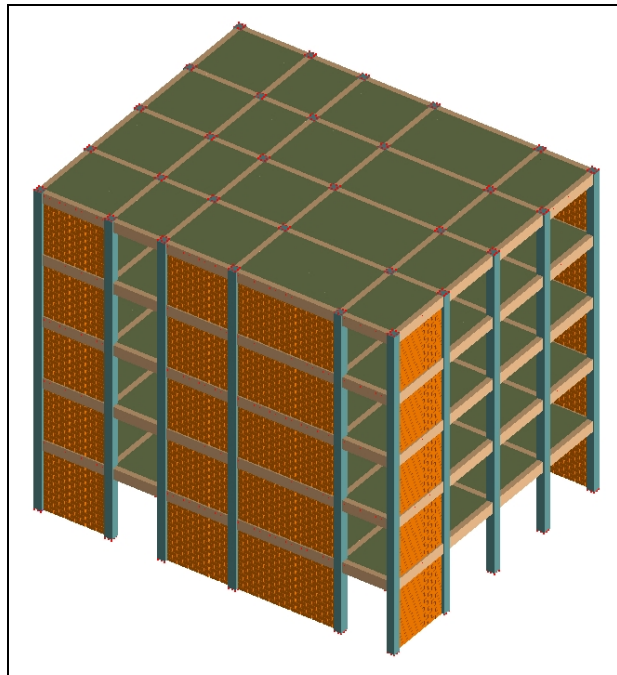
Three-dimensional views of the RC frame with unreinforced masonry infill walls.
